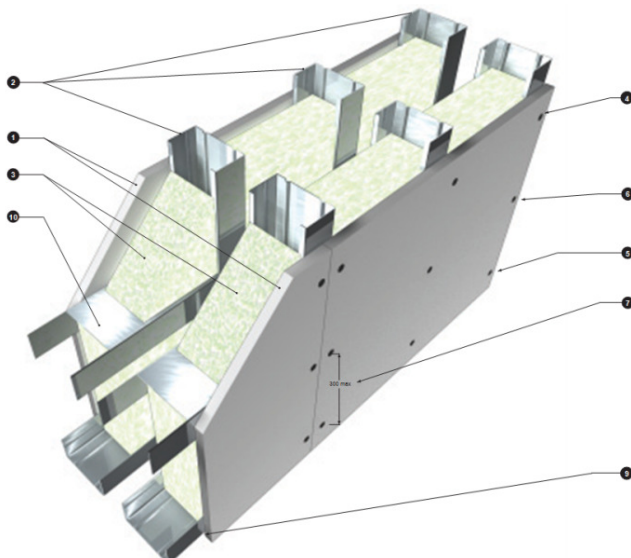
Steel Fire Wall Double Stud Single Board Each Side
